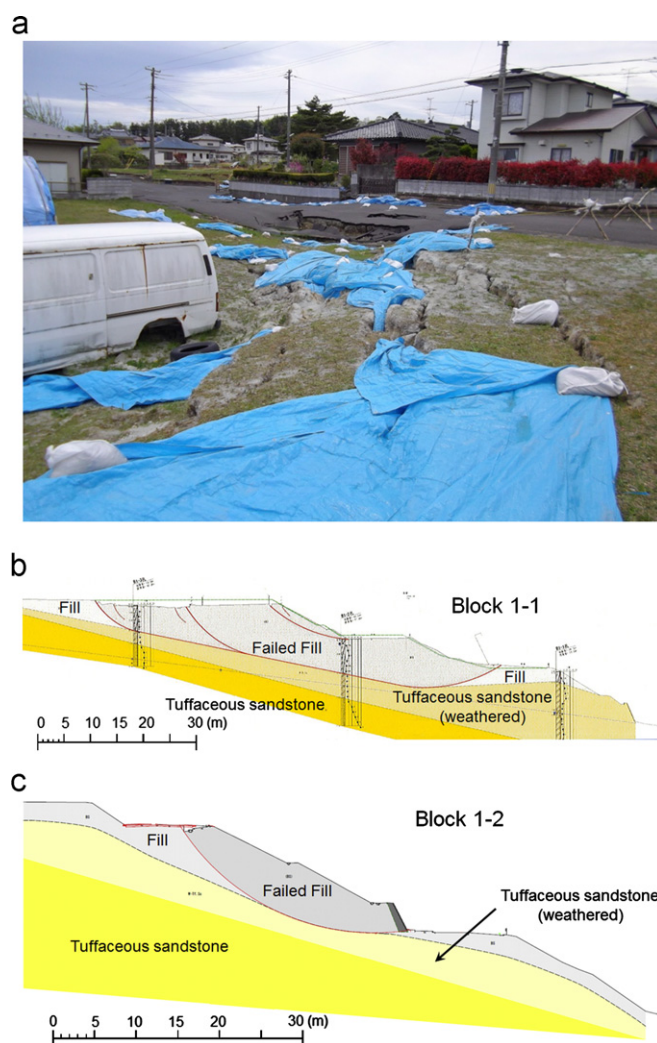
(a) View of crest at failed slope in Block 1-1 showing extensional cracks and vertical offsets, (b) cross-sectional profile of failed slope in Block 1-1 and (c) cross-sectional profile of failed slope in Block 1-2.
